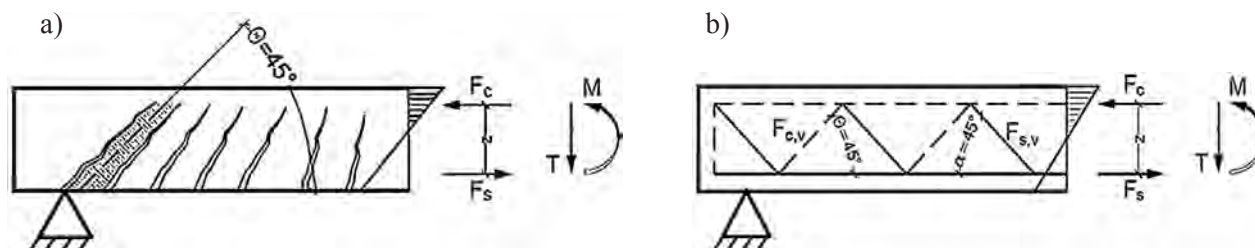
Support zone of reinforced concrete beam: a) distribution of cracks b) truss model
